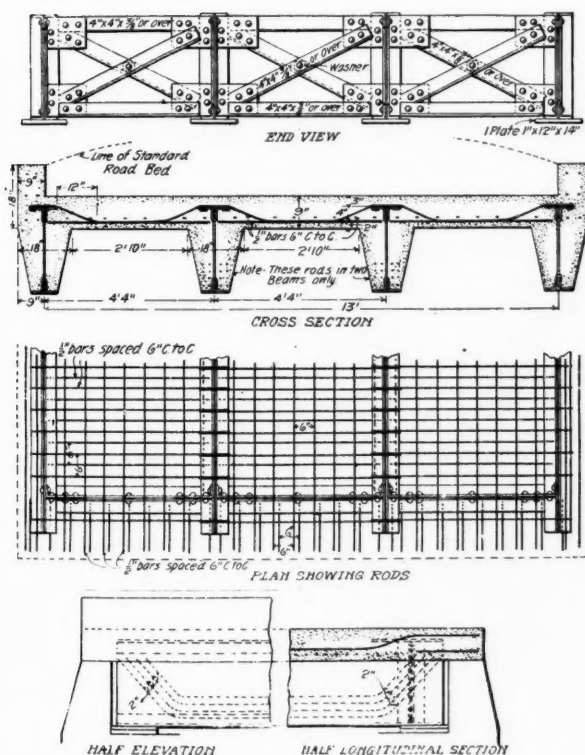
DESIGN OF REINFORCED CONCRETE FLOOR MADE OF OLD BRIDGE STRINGERS, WABASH R. R.
